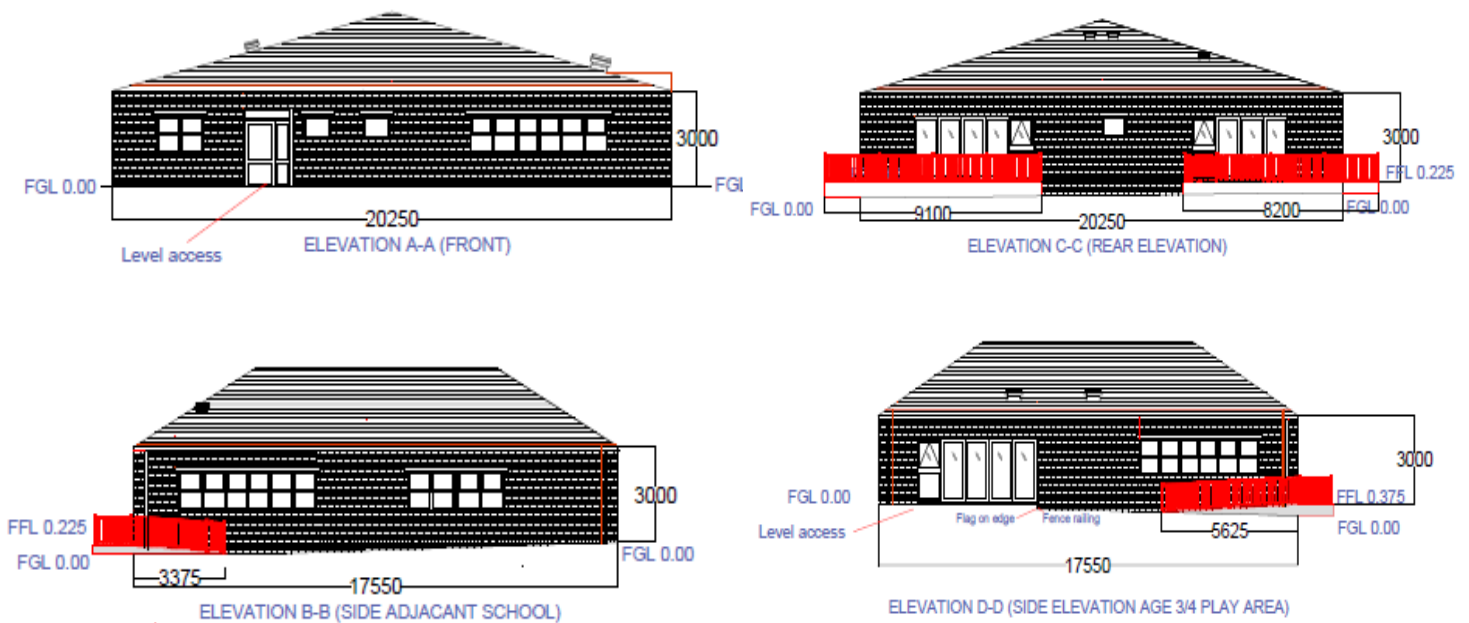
Proposed front (east) and side (south) elevations (left). Proposed rear (west) and side (north) elevations (right).
